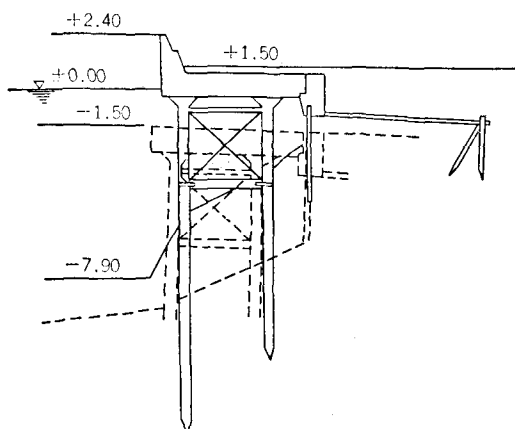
Cross Section of Trestle Type Pier in B Berth in Niigata Port
